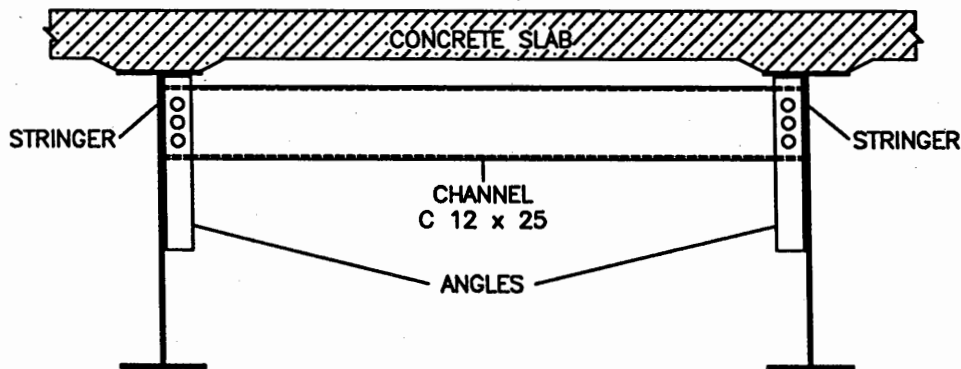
TYPICAL CHANNEL SECTION DIAPHRAGM AT SUPPORTS
